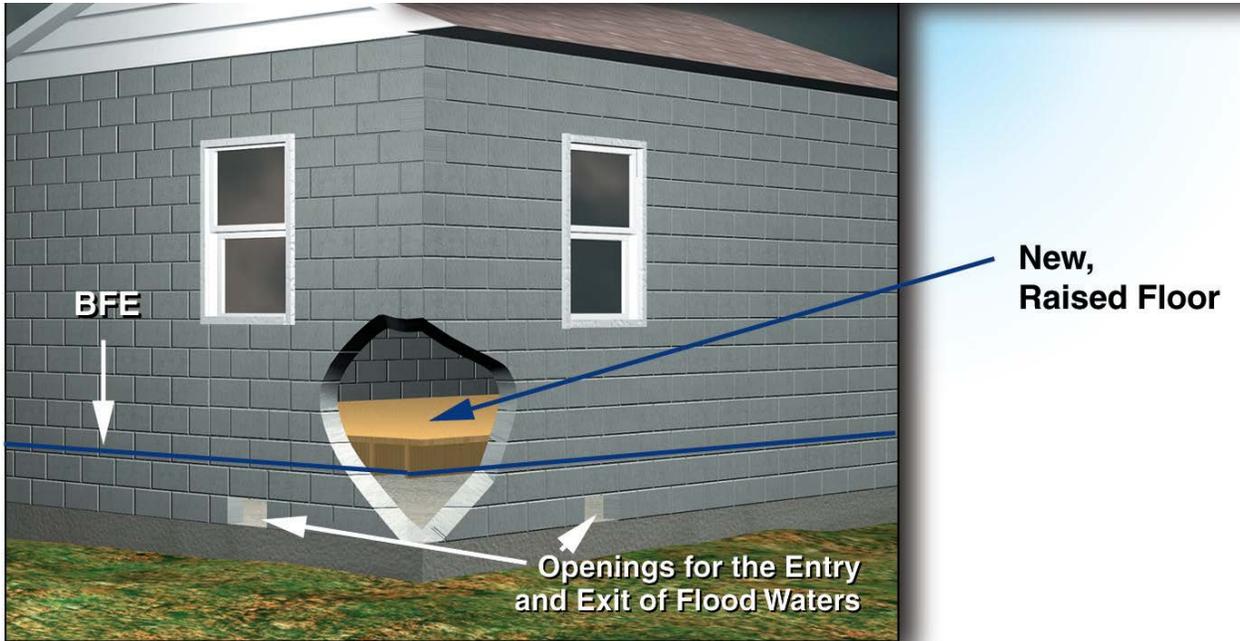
Interior of the building is retrofitted by raising the lowest to be one foot above base flood elevation
